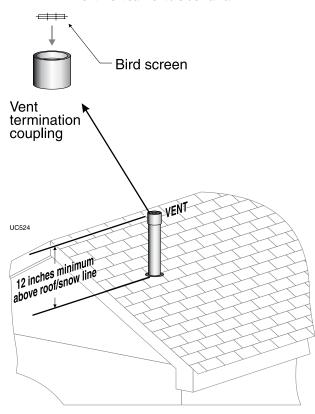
Sidewall air inlet (termination) for direct vent: vertical vent / sidewall air
